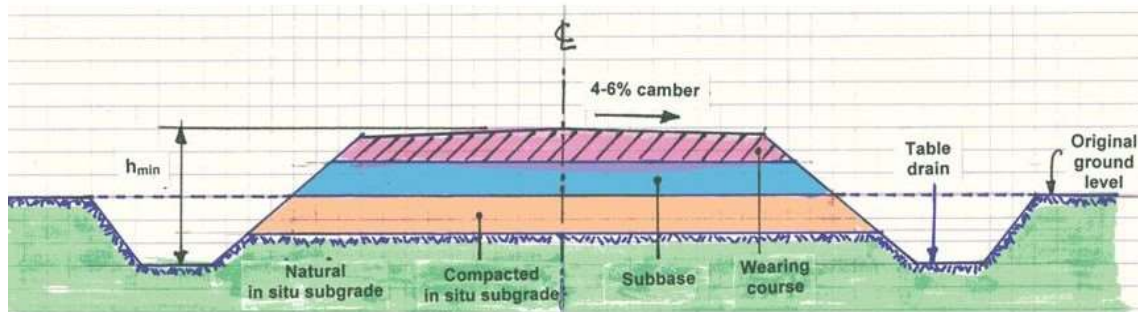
Typical cross section of gravel road (Pinard et al. 2019)
